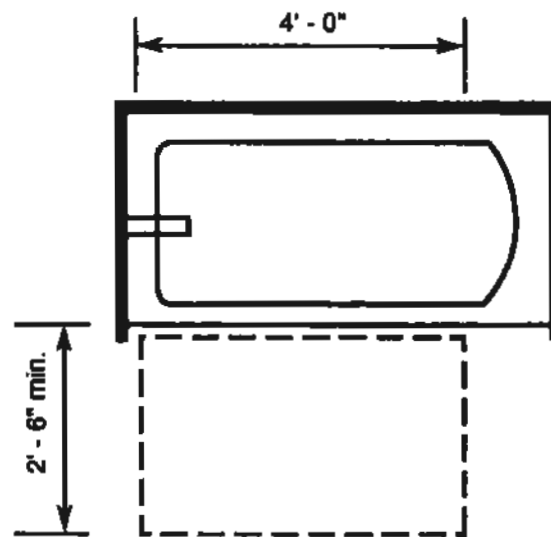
Alternative Specification – Clear Floor Space at Bathtub
